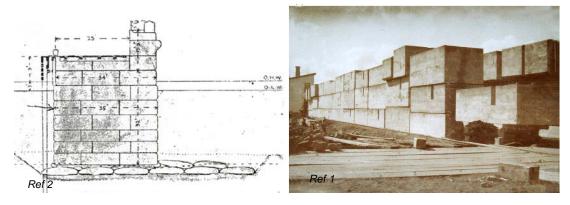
Warrnambool Breakwater keyed concrete block masonry construction
